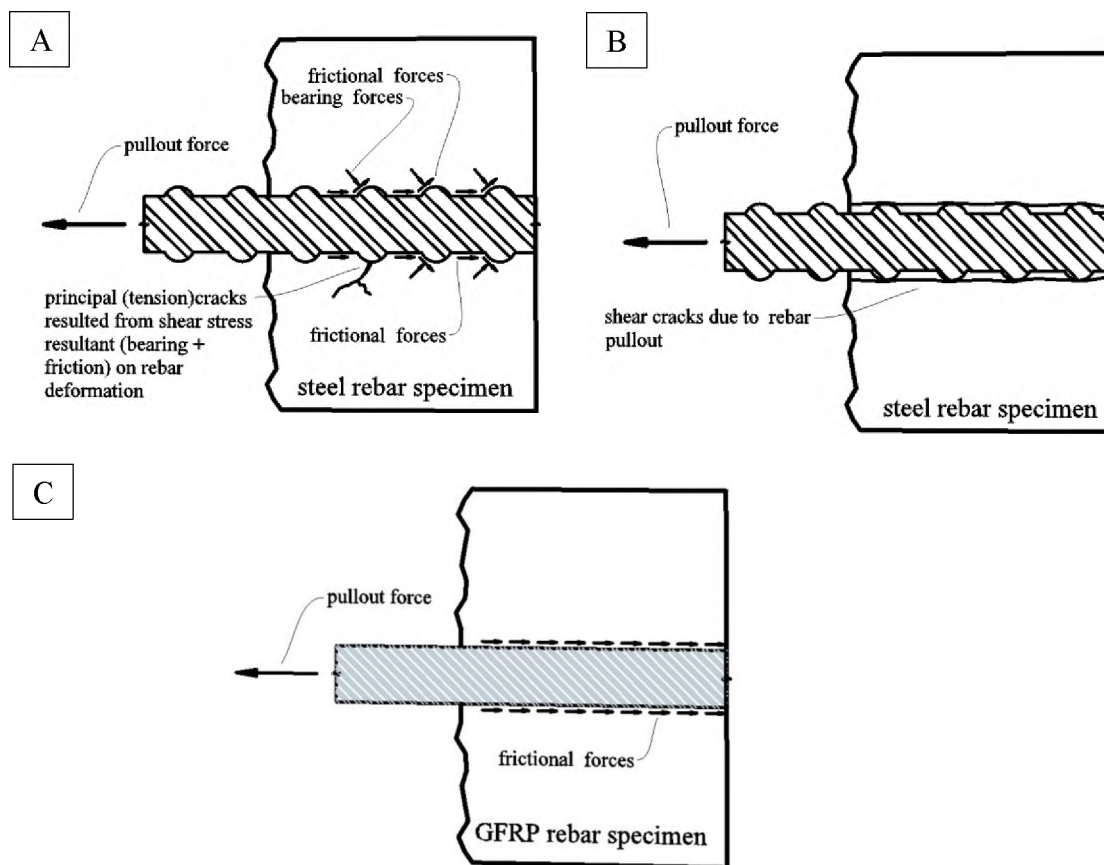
Pullout failure mechanism (A) forces and cracks generation – steel (B) rebar pullout – steel (C) rebar forces and pullout failure - GFRP
